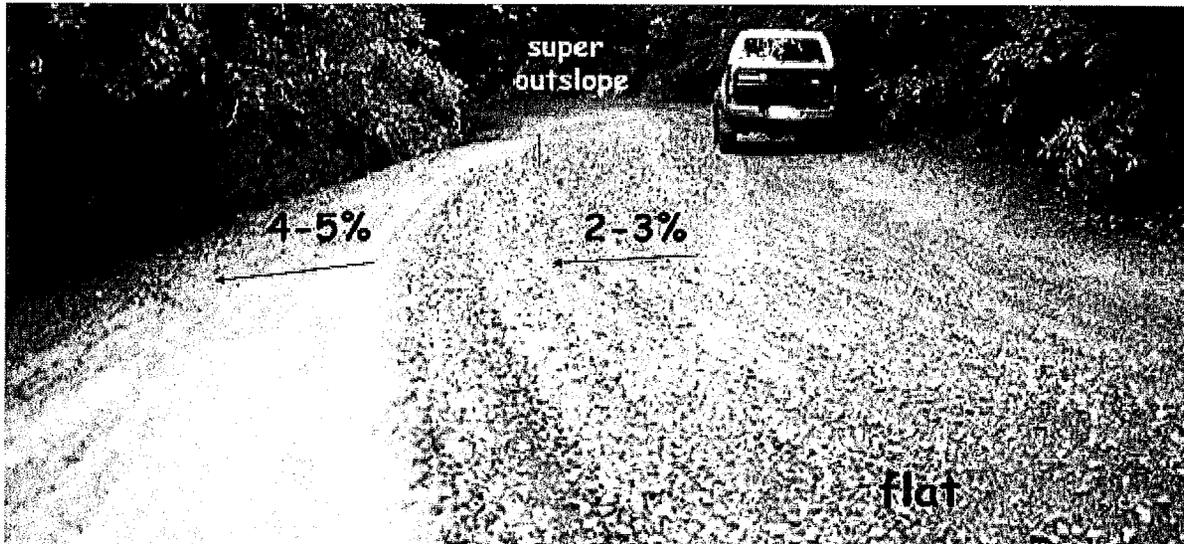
Road shape changes as the road travels through the landscape. For example, an out-sloped road will have a steep or “banked” outslope through inside curves, a consistent outslope through straight reaches and a flat or slightly insloped shape as it goes through an outside curve. The road may have an outslope of 2-3% across the travel surface while the shoulder is more steeply outsloped to ensure runoff and sediment will leave the roadbed.
